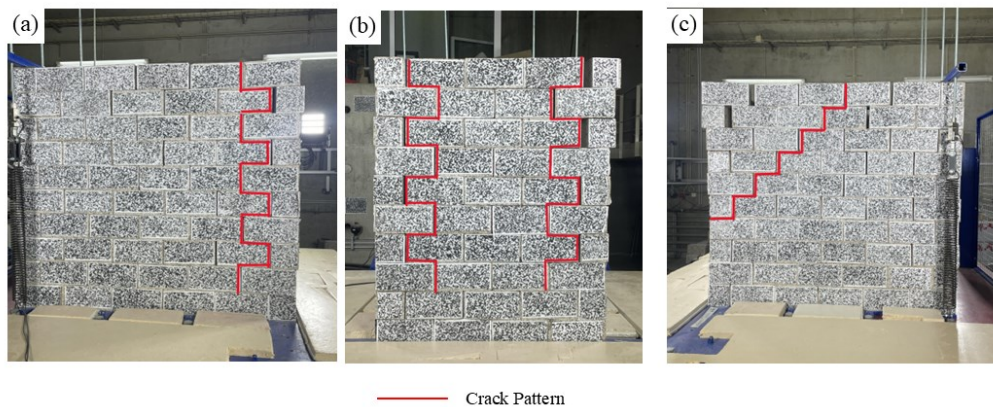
Observed damage before the collapse at 0.524 g: (a) interface separation of the façade from west return wall, (b) return walls opening seen in the façade, and (c) diagonal crack in the east return wall.
